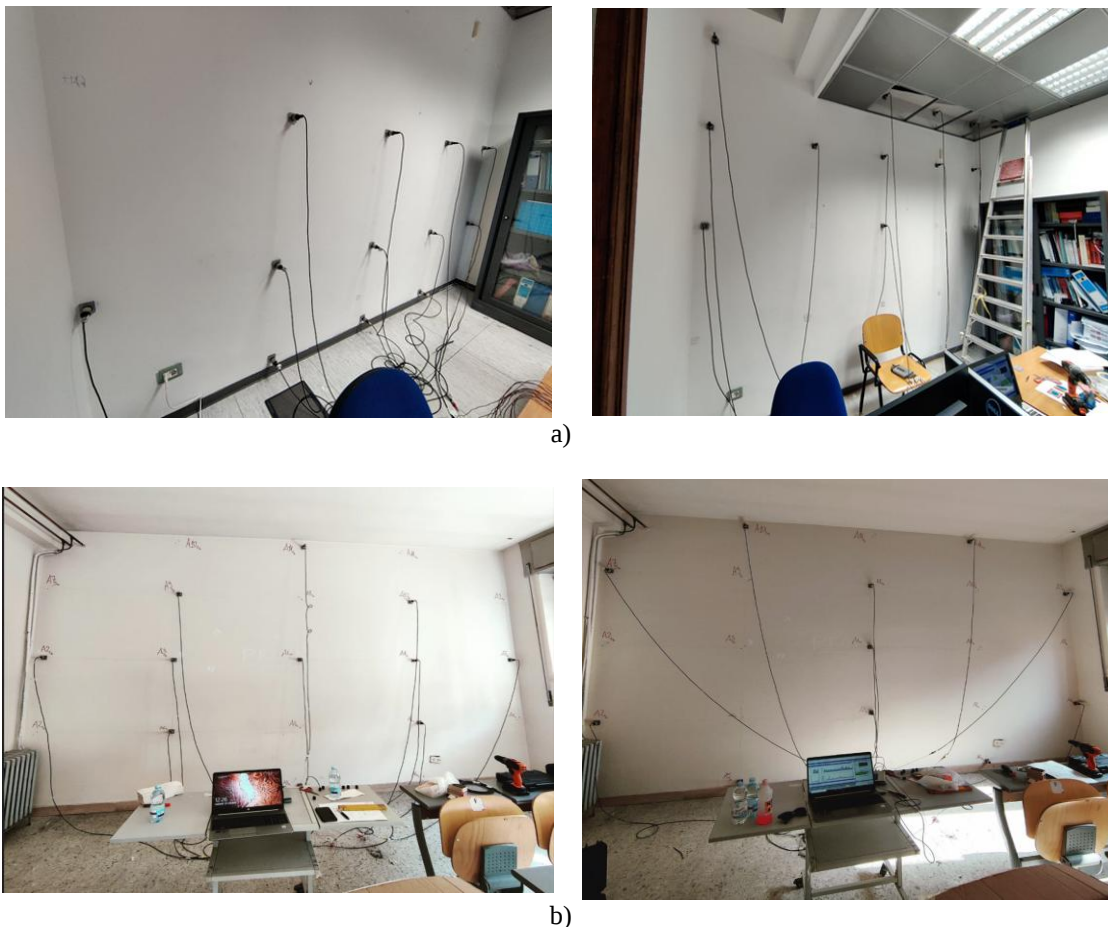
Pictures of the sensors layout in each setup for a single leaf (a) and double leaves (b) partition walls.
